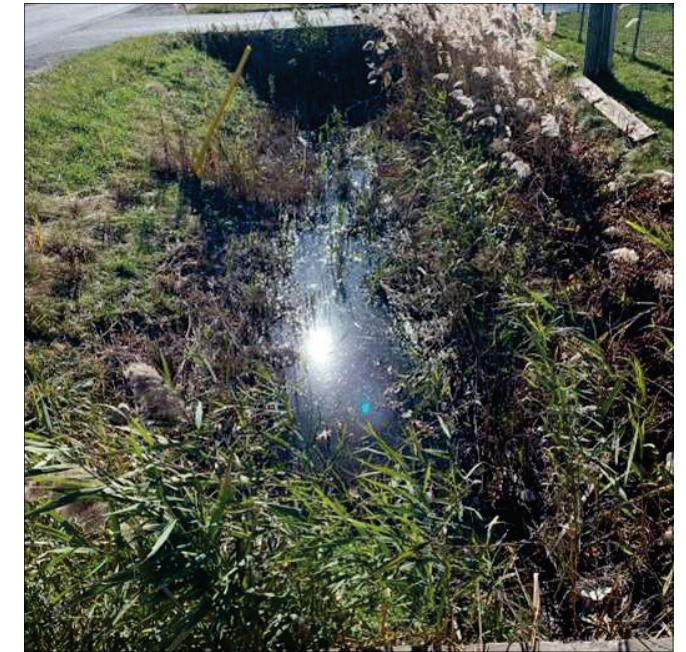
Watercourse Crossing 2, linear ditch inundated with water, north of 401 underpass, parallel to Concession Road 8.
